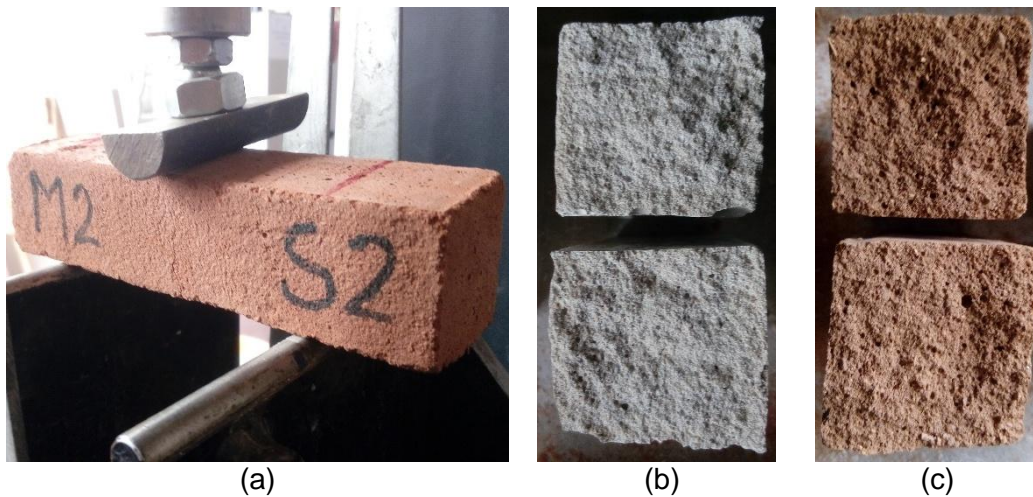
Destructive testing for flexural strength in mortar specimens (a) placement of the prism on the testing machine; failure of (b) cement mortar M1 and (c) earth mortar M2
